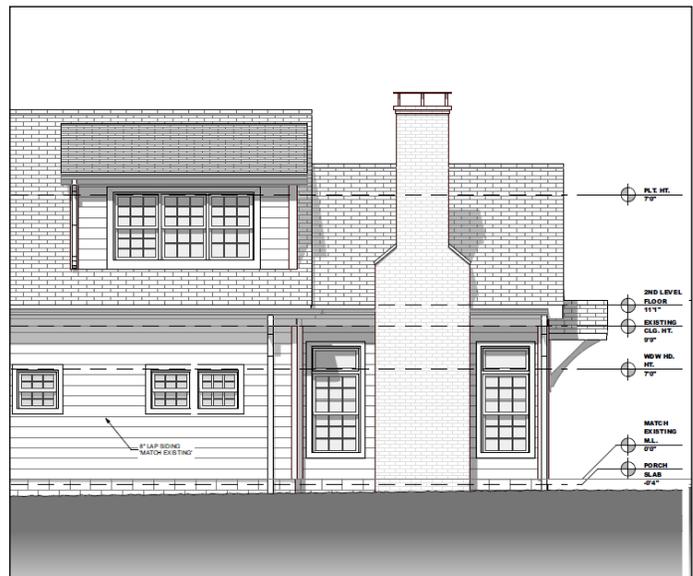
The drawings approved for Preservation Permit 2020-031856 indicated the chimney being clad in brick.
